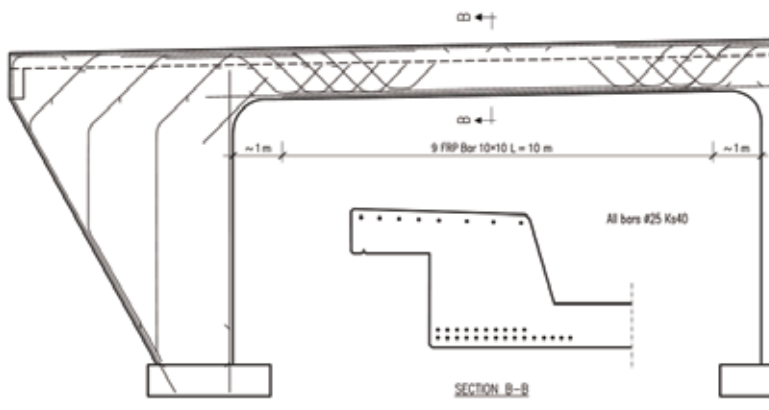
Longitudinal section from East of the tested span with bending steel reinforcement according to construction drawings from 1954 and the strengthening with NSM CFRP applied before the final test to failure.
